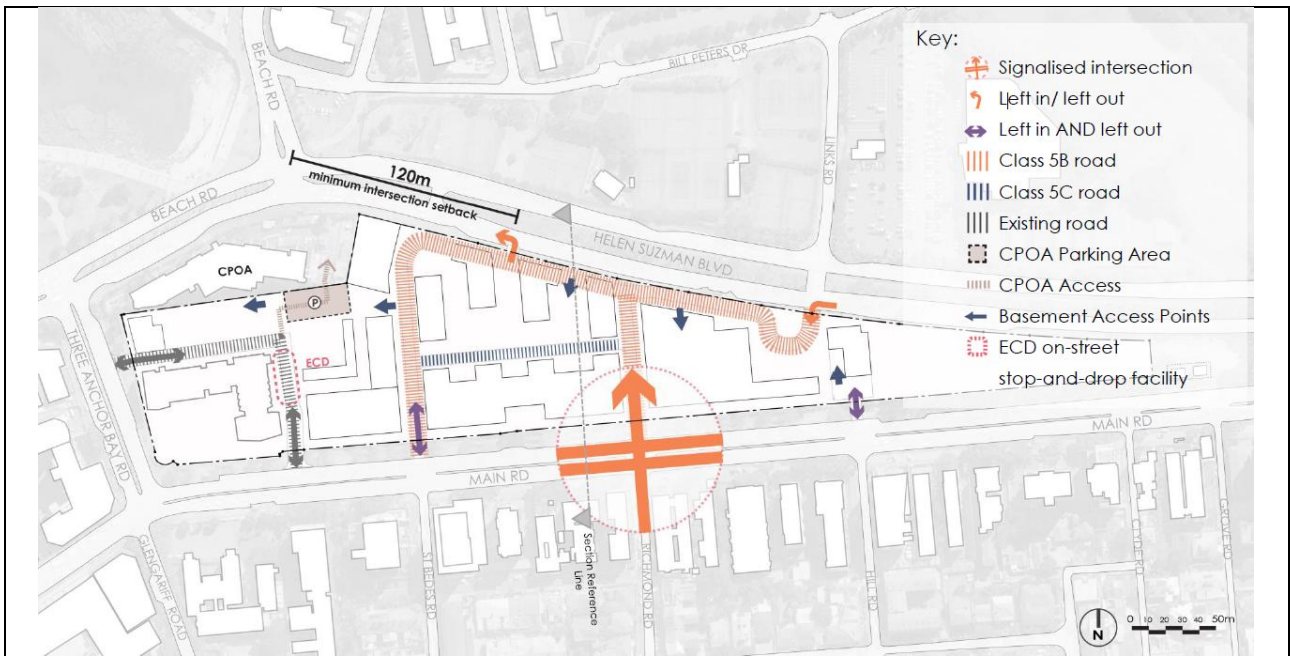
Potential access points for the proposed mixed-use development on Erf 2187, Three Anchor Bay (ACG architects)
